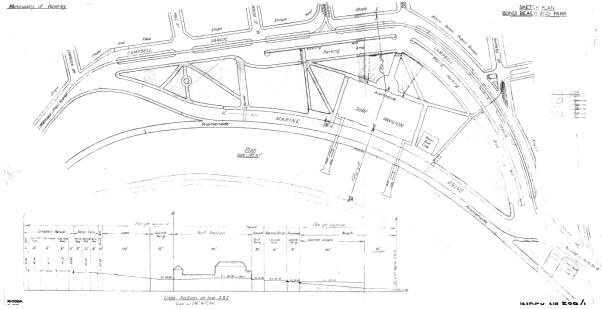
Undated plan showing the path layout and an overall section. Source: Held by the Engineering Department of Waverley Council. Plan 529
